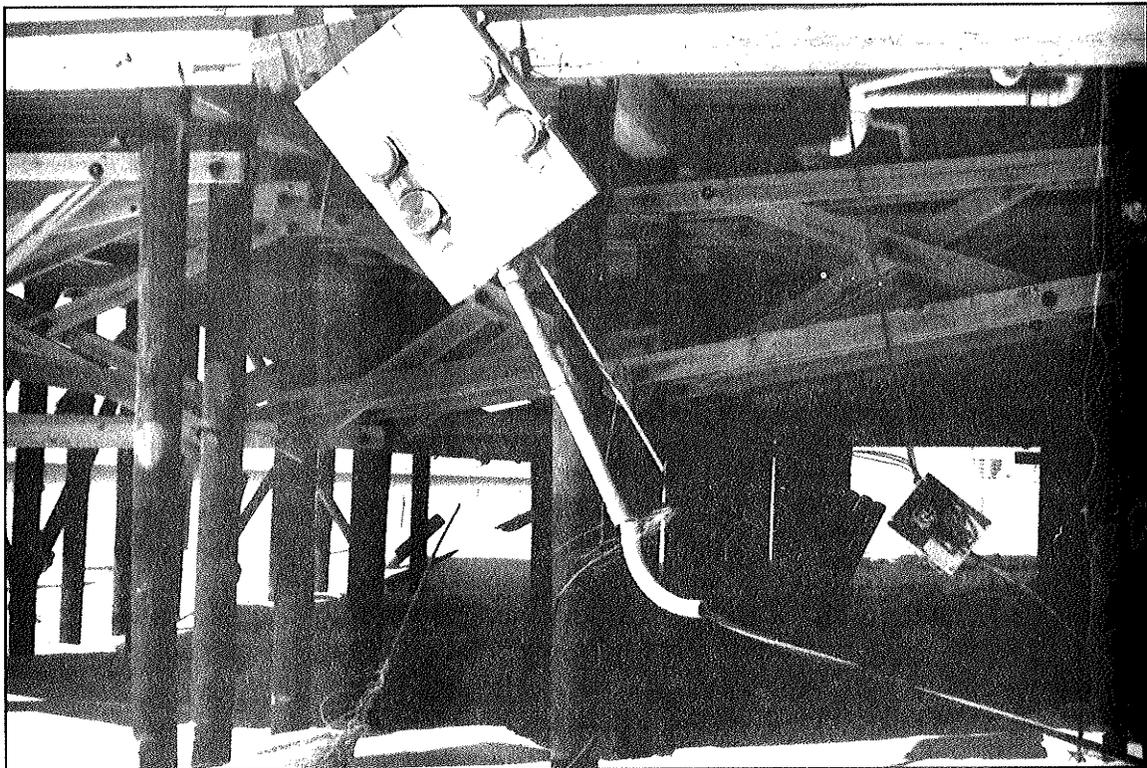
Utility lines and boxes dislocated by hurricane forces. Note that the cross-bracing and pile support system remain in good condition after the storm.
